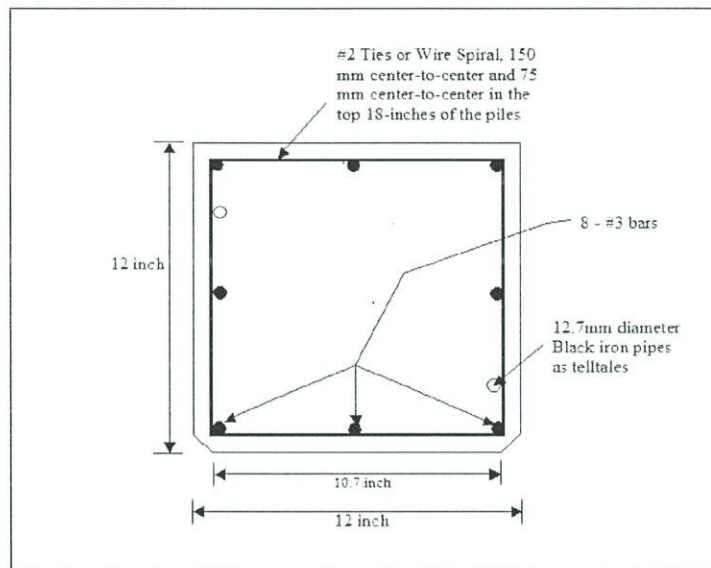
Reinforcement Details for Precast Concrete Pile
